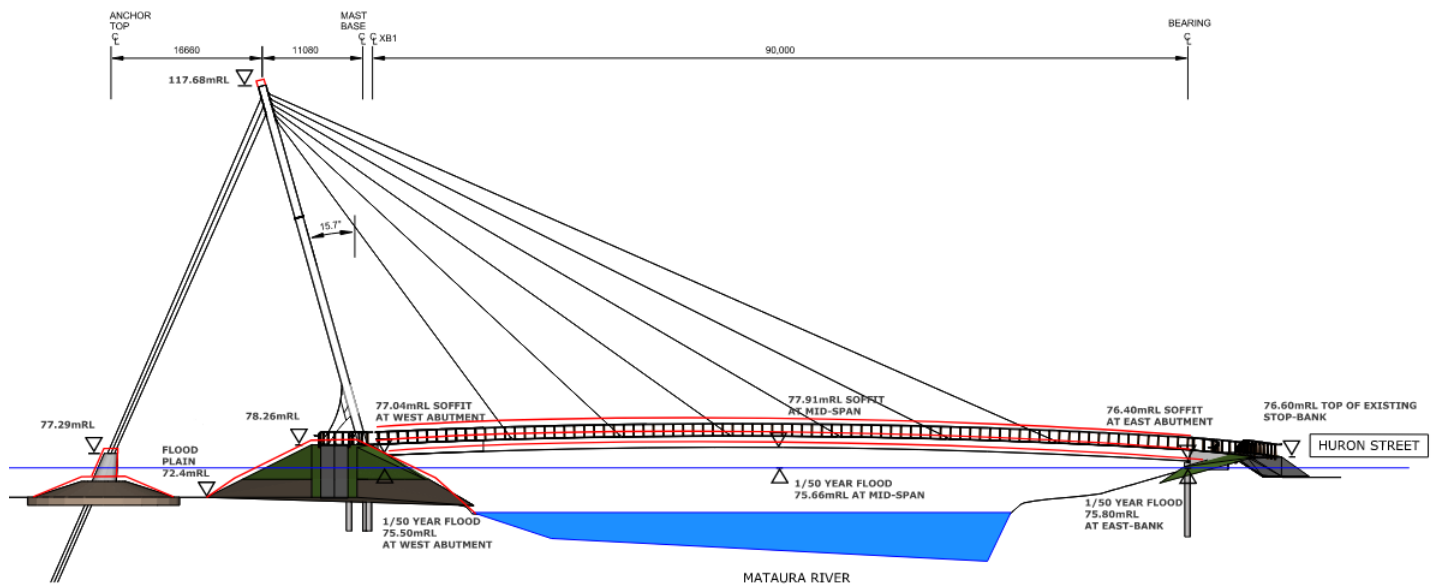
(above) – Long-section showing indicative changes (drawn to scale) caused by lifting bridge by 500mm.
